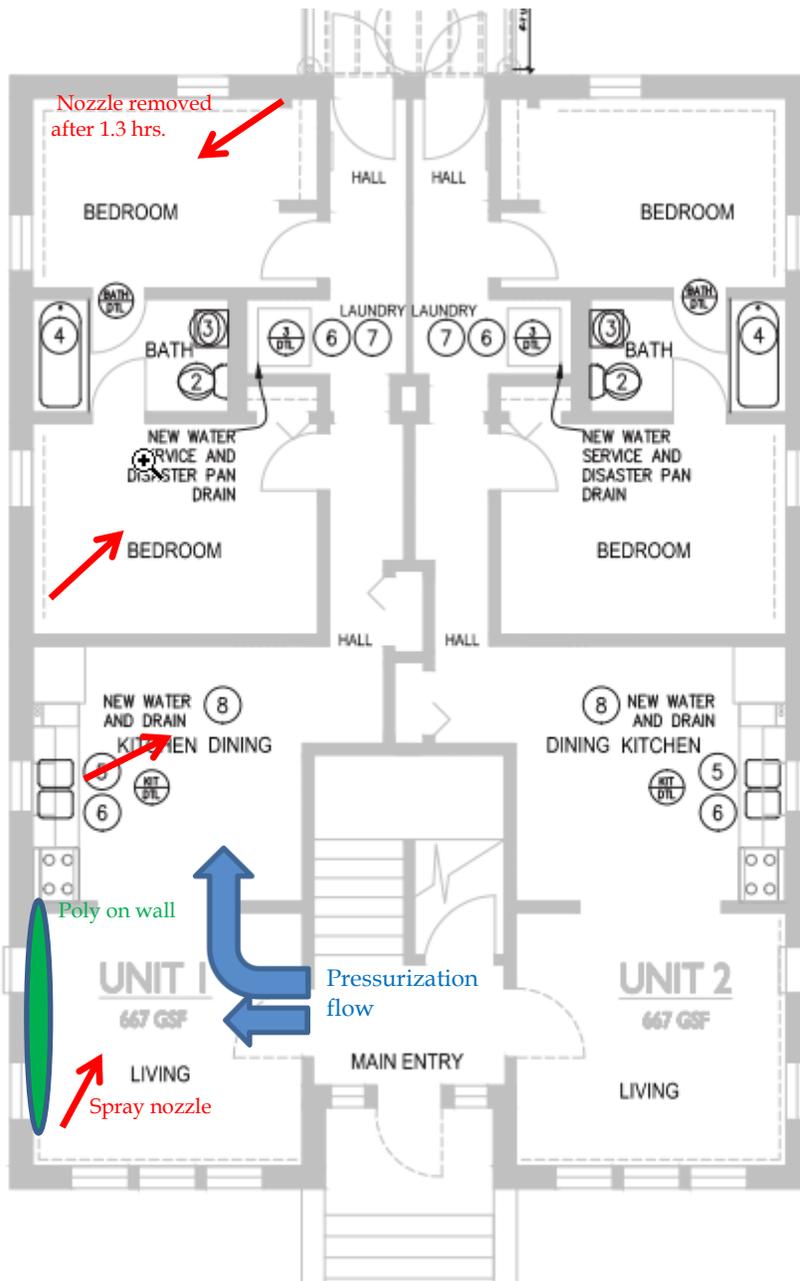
Unit 1 floor plan with nozzle and fan locations¹⁷
